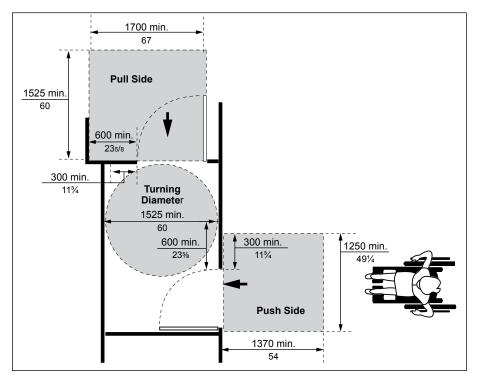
Doors in Series Where Doors are not Aligned - Plan View
